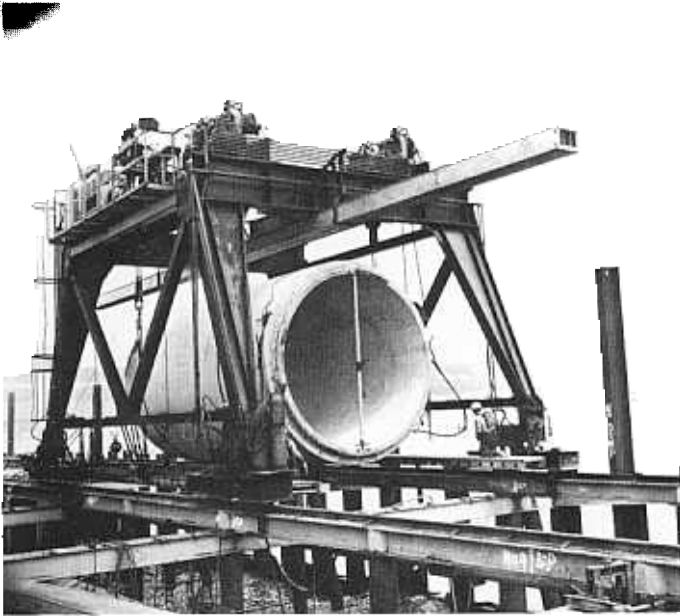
Lightweight concrete pipe used in Pacific Coast Power Plant water system
